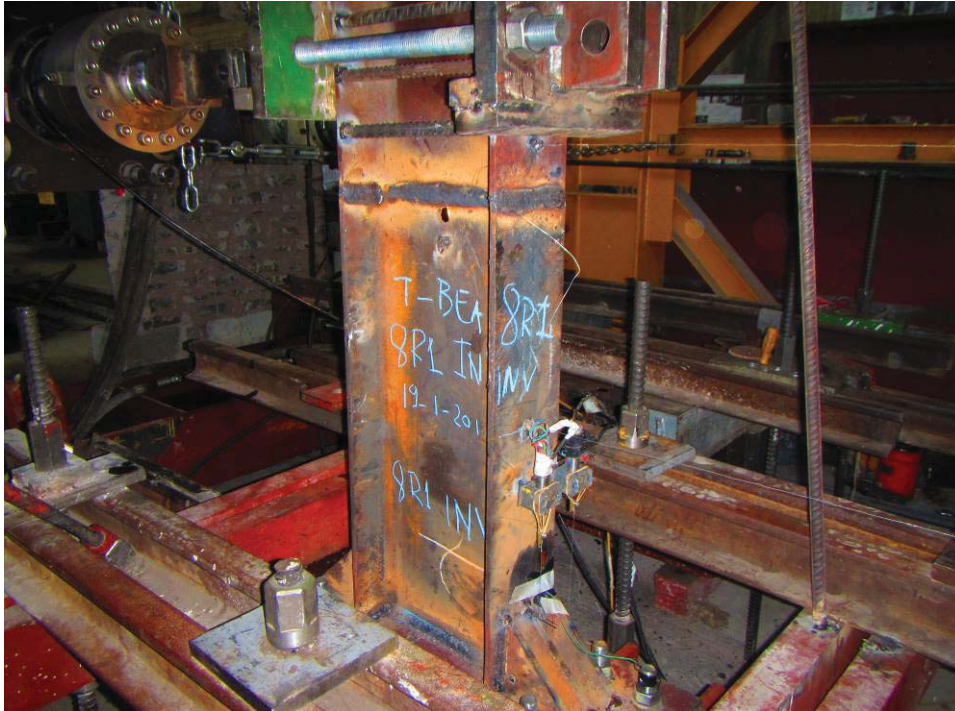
Details of the experimental setup with the tested IPE 300 T-Beam 8R1 INV beam-to-column joint specimen
